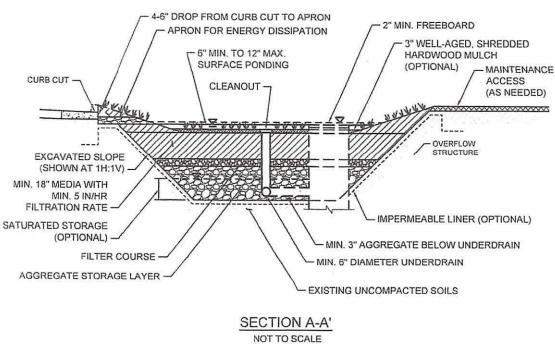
E.13-1: Typical plan and Section view of a Biofiltration BMP
